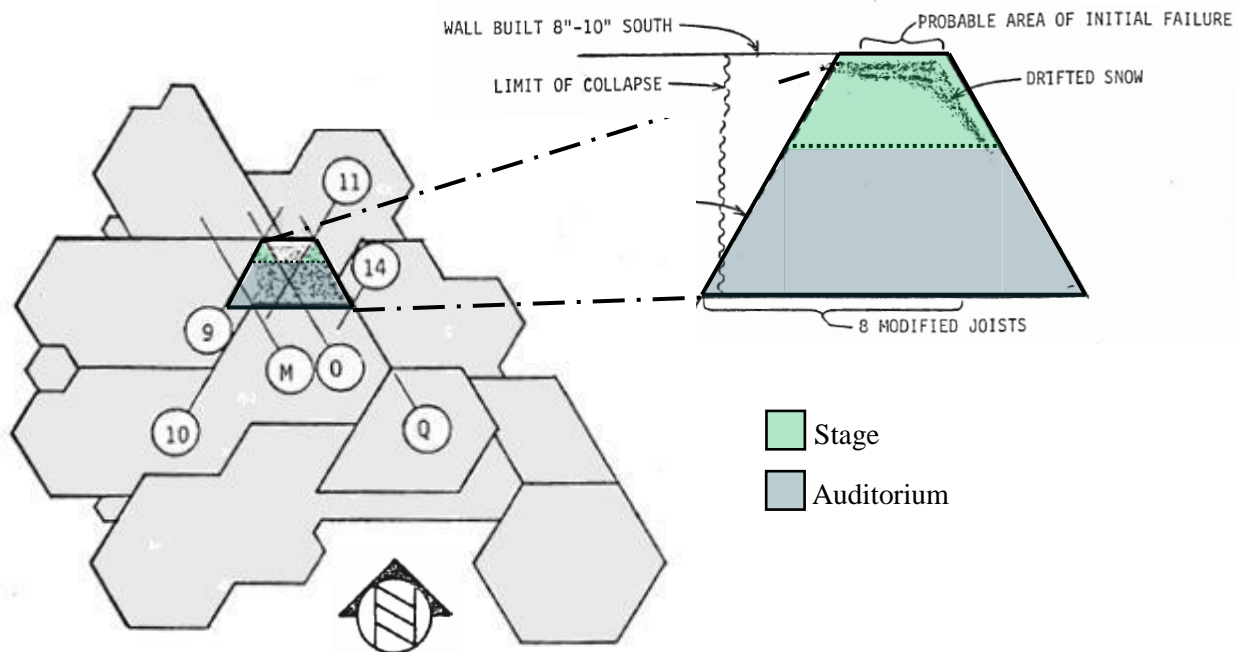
Plan view of building with enlarged view of collapsed area (J.R. Harris & Co. 2011).
